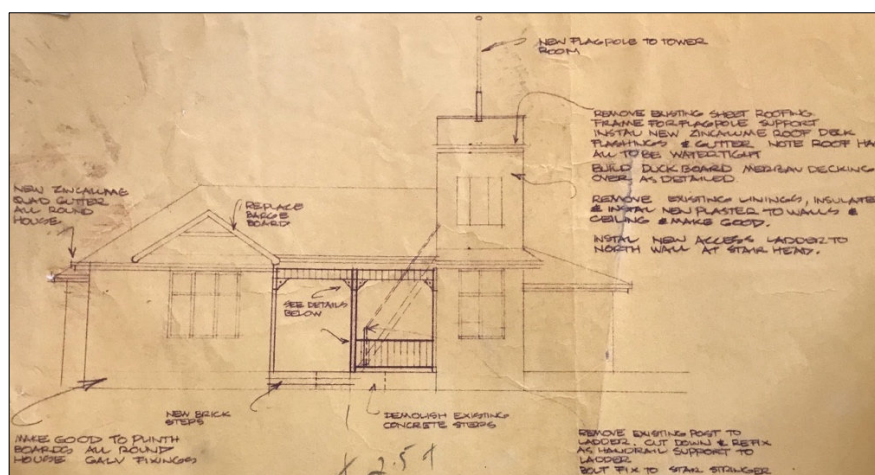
Part of the 1984 building plans showing alterations to the front elevation. Source: Banyule City Council.
